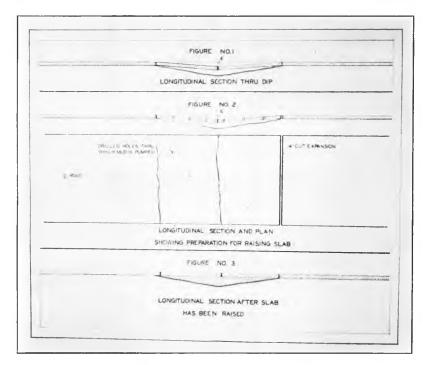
Plan and elevation views illustrating method of raising pavements.
